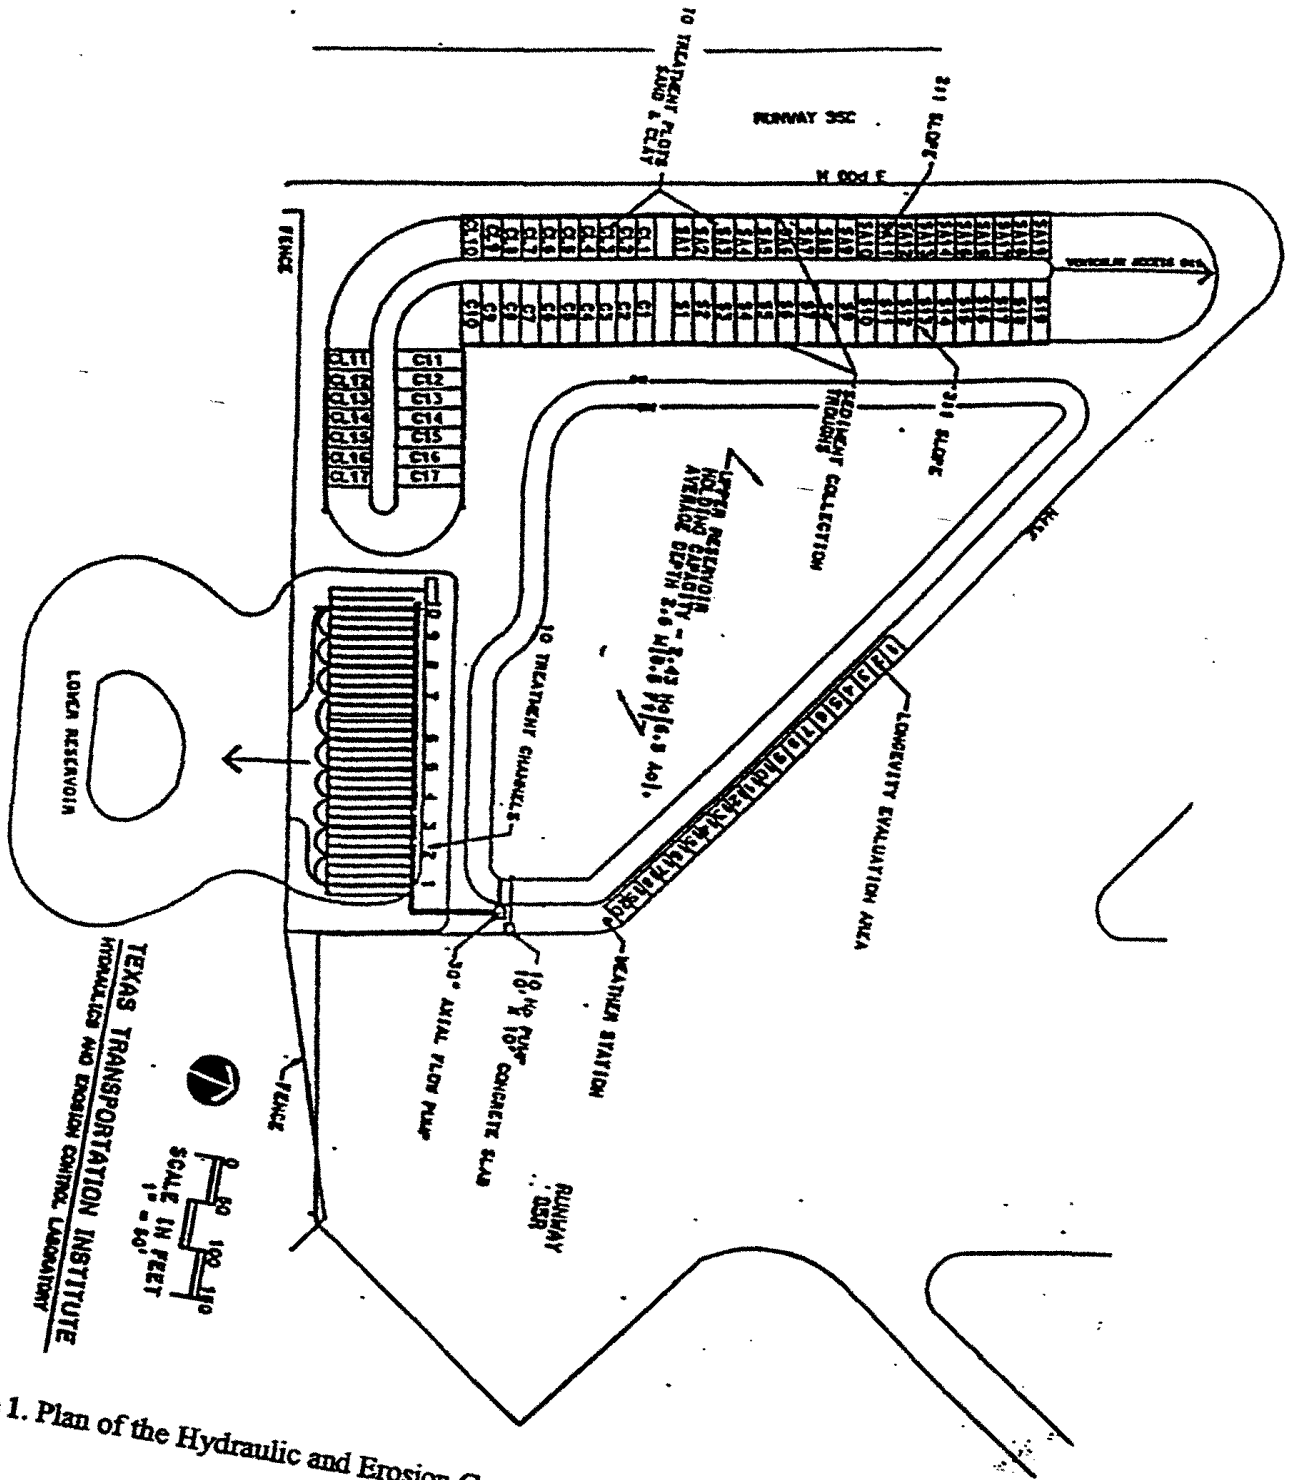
Plan of the Hydraulic and Erosion Control Laboratory
